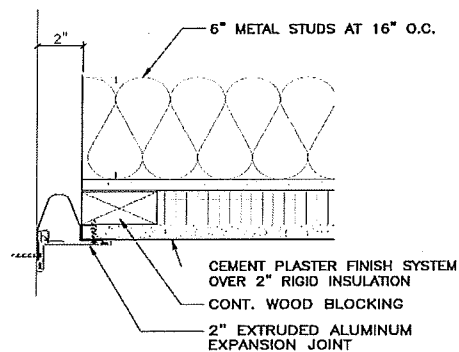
Connection Details – Plan Details. New connector wall to Building 2 wall. (Source: KPA Group, 65% construction documents Set dated 3/29/17. See Exhibit 5, Sheet AE908).
